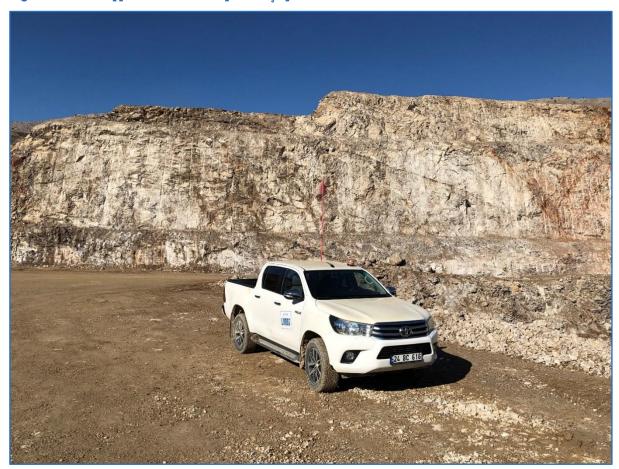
Typical 15 m Pre-Split at Çöpler Mine
